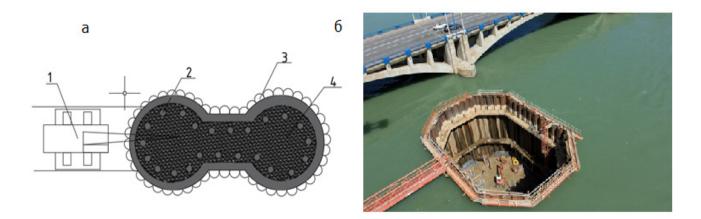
Cofferdam structure: a — cofferdam construction diagram; b — finished cofferdam; 1 — assembly crane; 2 — piles lowered into the water; 3 — welded metal structure; 4 — concrete base
